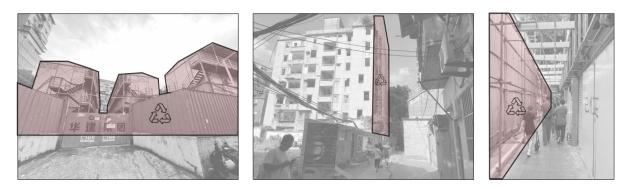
Reusable Containers and Scaffolding on the Site Source: author
